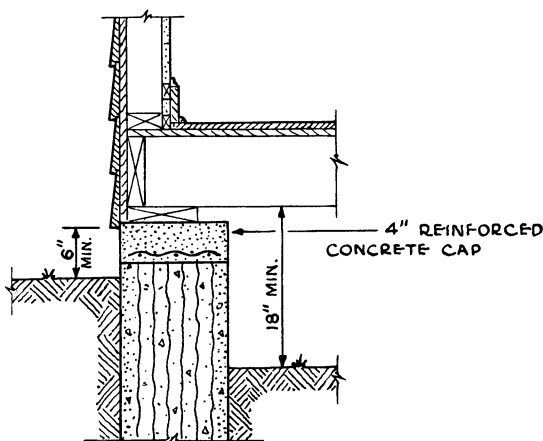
A reinforced poured-concrete cap on masonry walls or piers, preventing hidden attack by termites. This cap should be at least 4 inches thick and must be poured in one continuous operation so as to avoid joints. Minimum clearance of 18 inches under the building and 6 inches outside will allow inspection for the presence of termite tubes or for possible cracking of the cap.
